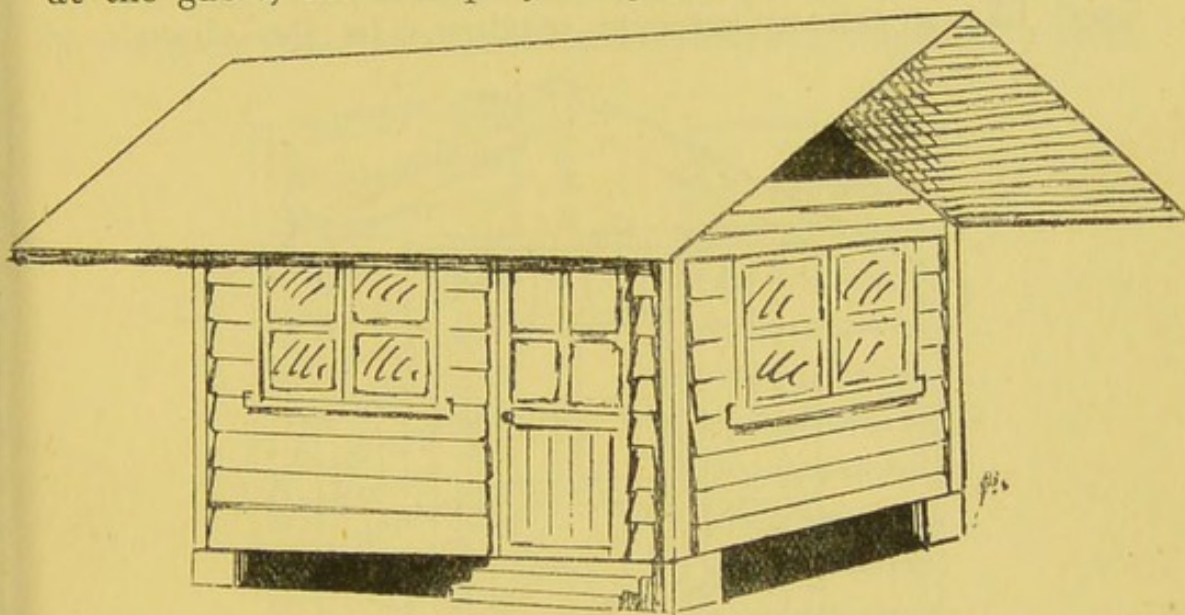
SHELTER WITH WIDE EAVES—FRONT VIEW.
